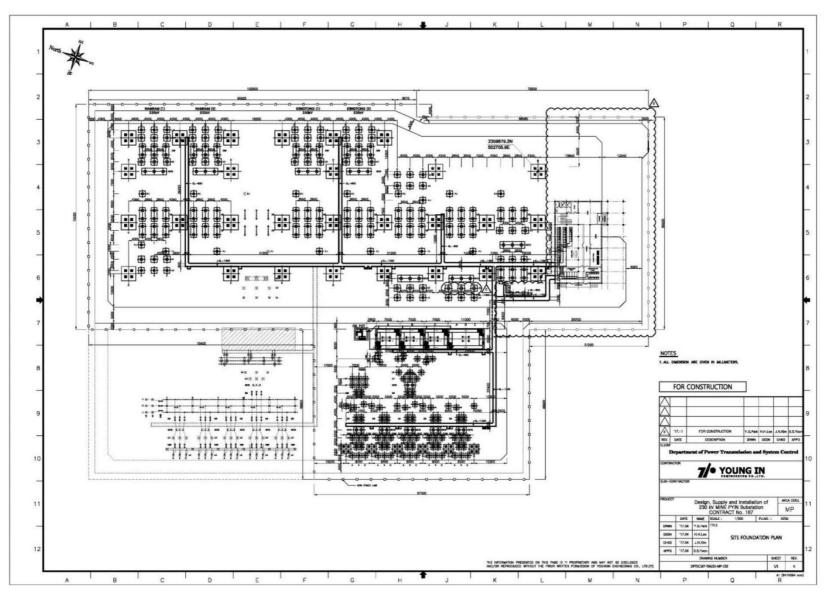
The Site Foundation Plan of Proposed Project Site
